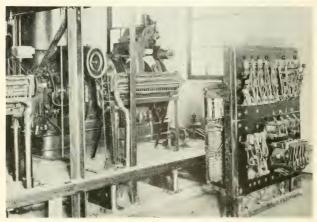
VIEW OF MOTOR, SWITCHBOARD, POSITION INDICATOR MECHANISM, ETC. Control board lettered to correspond with wiring diagram. Contactor for position indicator shown in center of illustration in front of motor. Travel indicator shown in background at left. Contacts numbered 202 and 203 in the wiring diagram, are at the top of the brake magnet.
